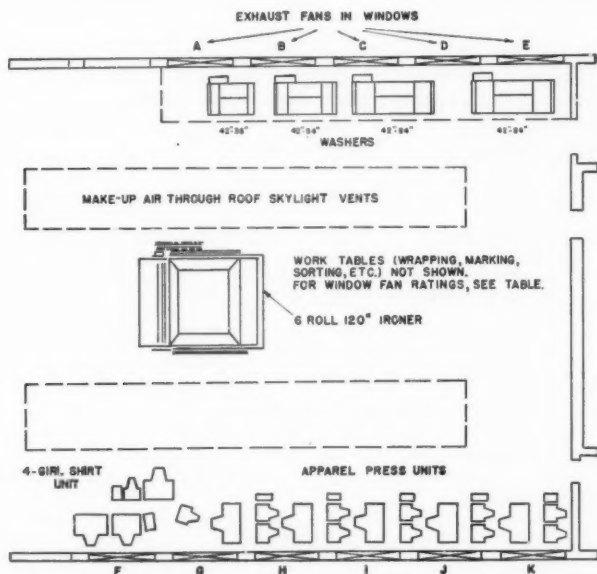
LAYOUT OF WASHERS, IRONER AND PRESSES IN A LAUNDRY SHOWING LOCATION OF FANS AND MAKE-UP AIR INLETS
